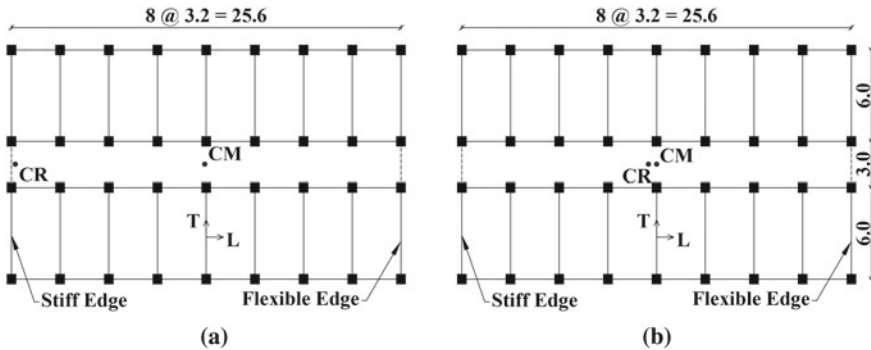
Typical plan layouts: a floor plan of SB building, at the floor immediately above the topmost foundation level, and b floor plan of the SB building, at the roof level. The dotted lines determine the boundaries of the floor slab (CM and CR represents the locations of the centre of mass and centre of rigidity in the floor plan, Longitudinal (L) direction is considered to be along-slope, whereas, transverse (T) direction is considered to be across-slope)
